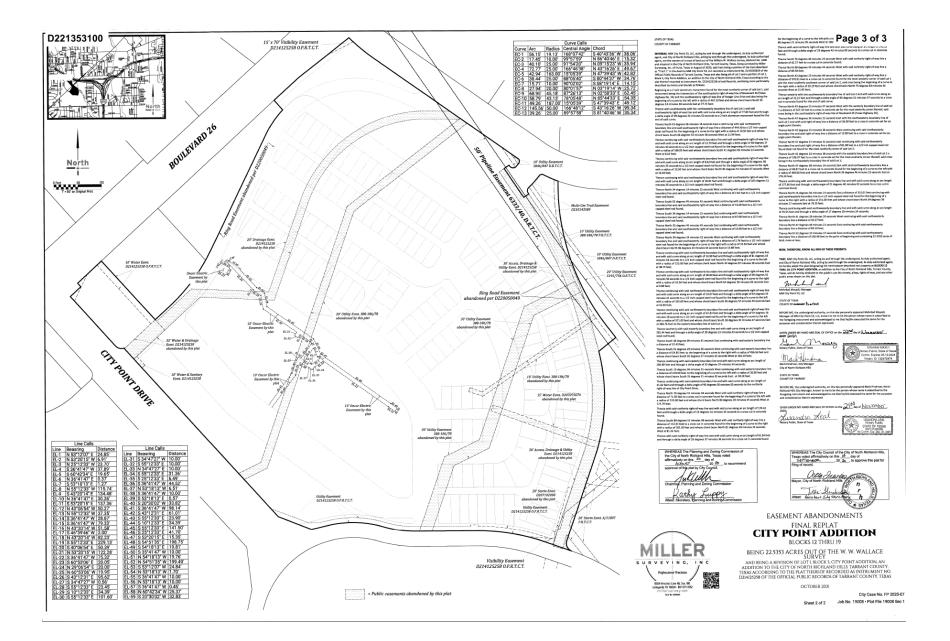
FINAL PLAT CITY POINT SECTION 2
